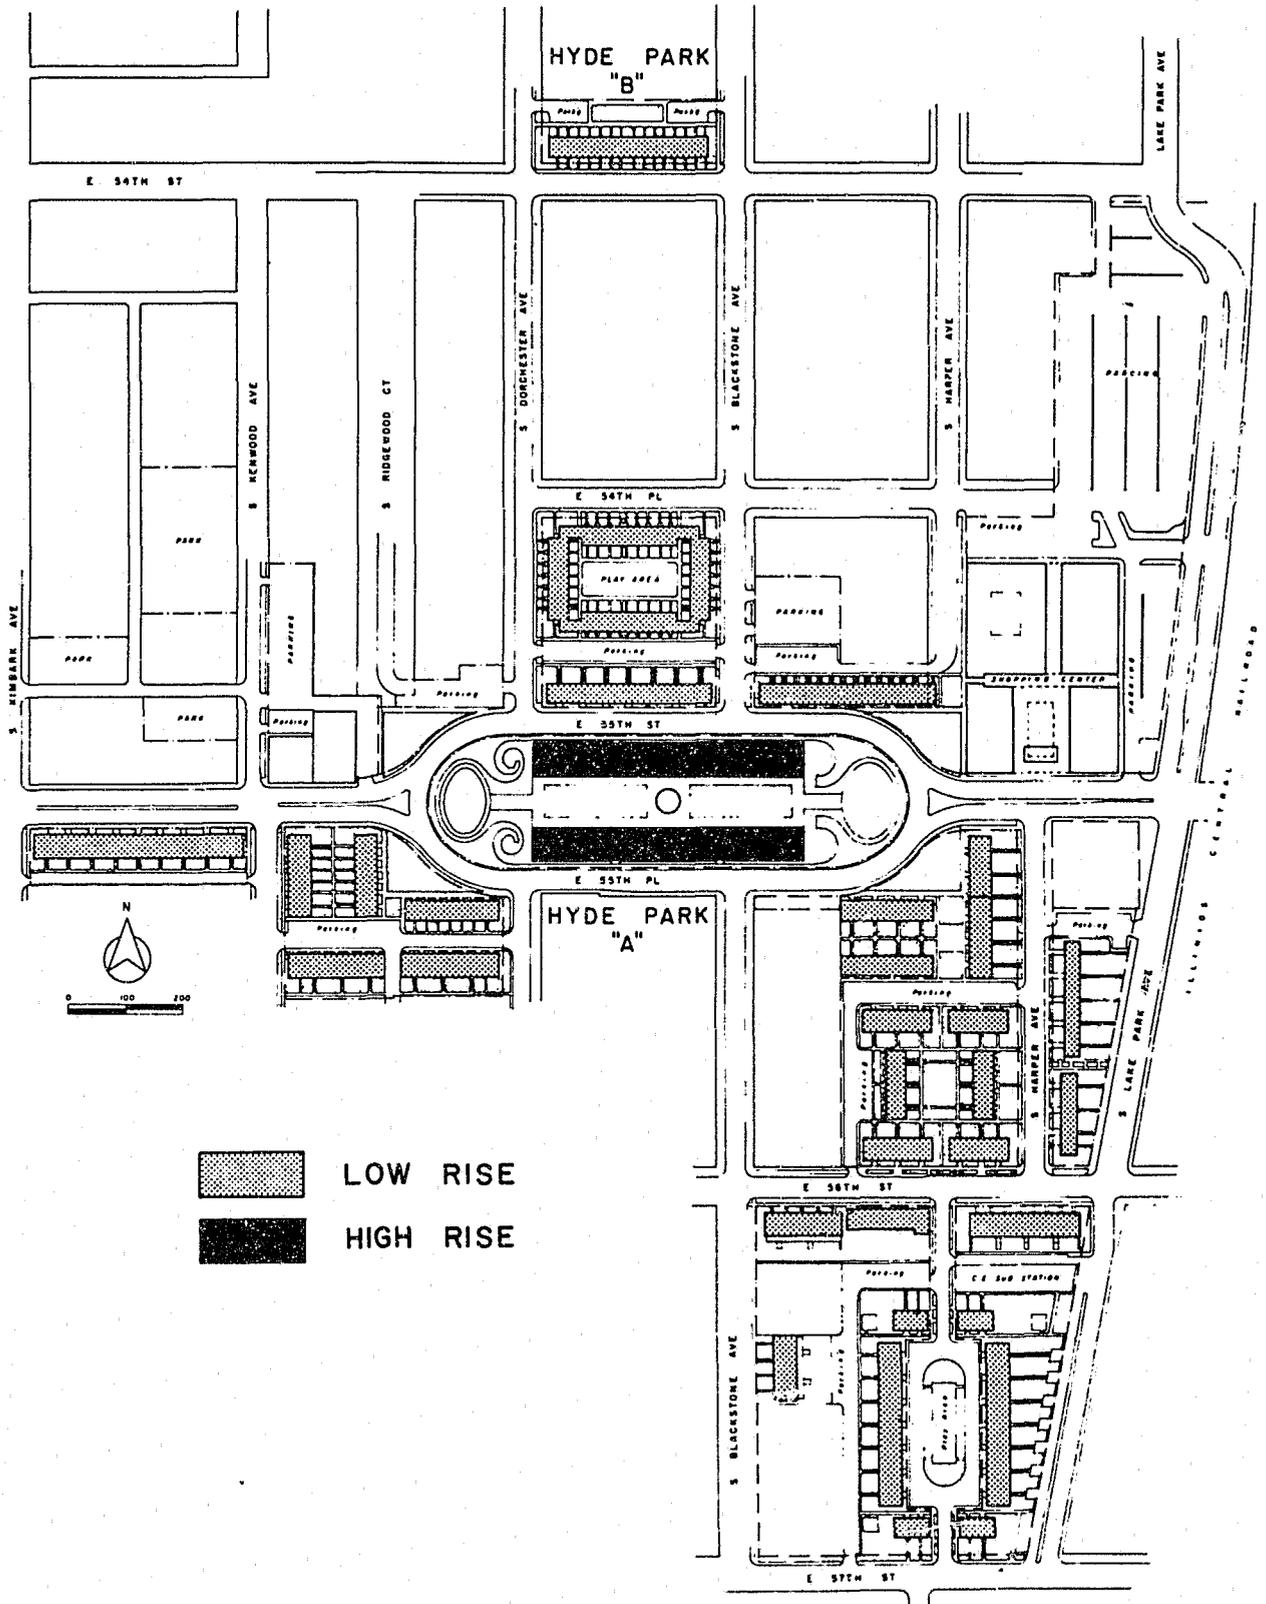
Hyde Park, Chicago, Ill. Site plan.
